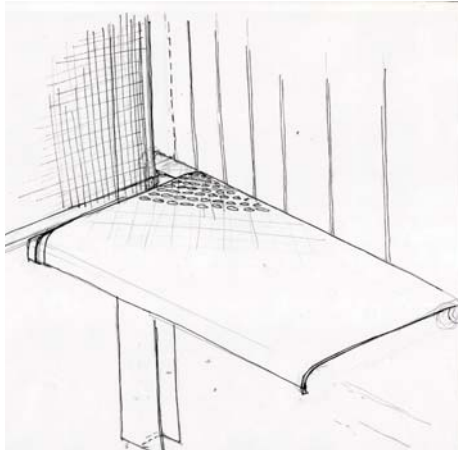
Steel bench. 76 dia round, hollow steel sections welded to main structure with 2mm perforated metal sheet seating bended to specification and, welded to frame frame. Galvanised afterwards.
